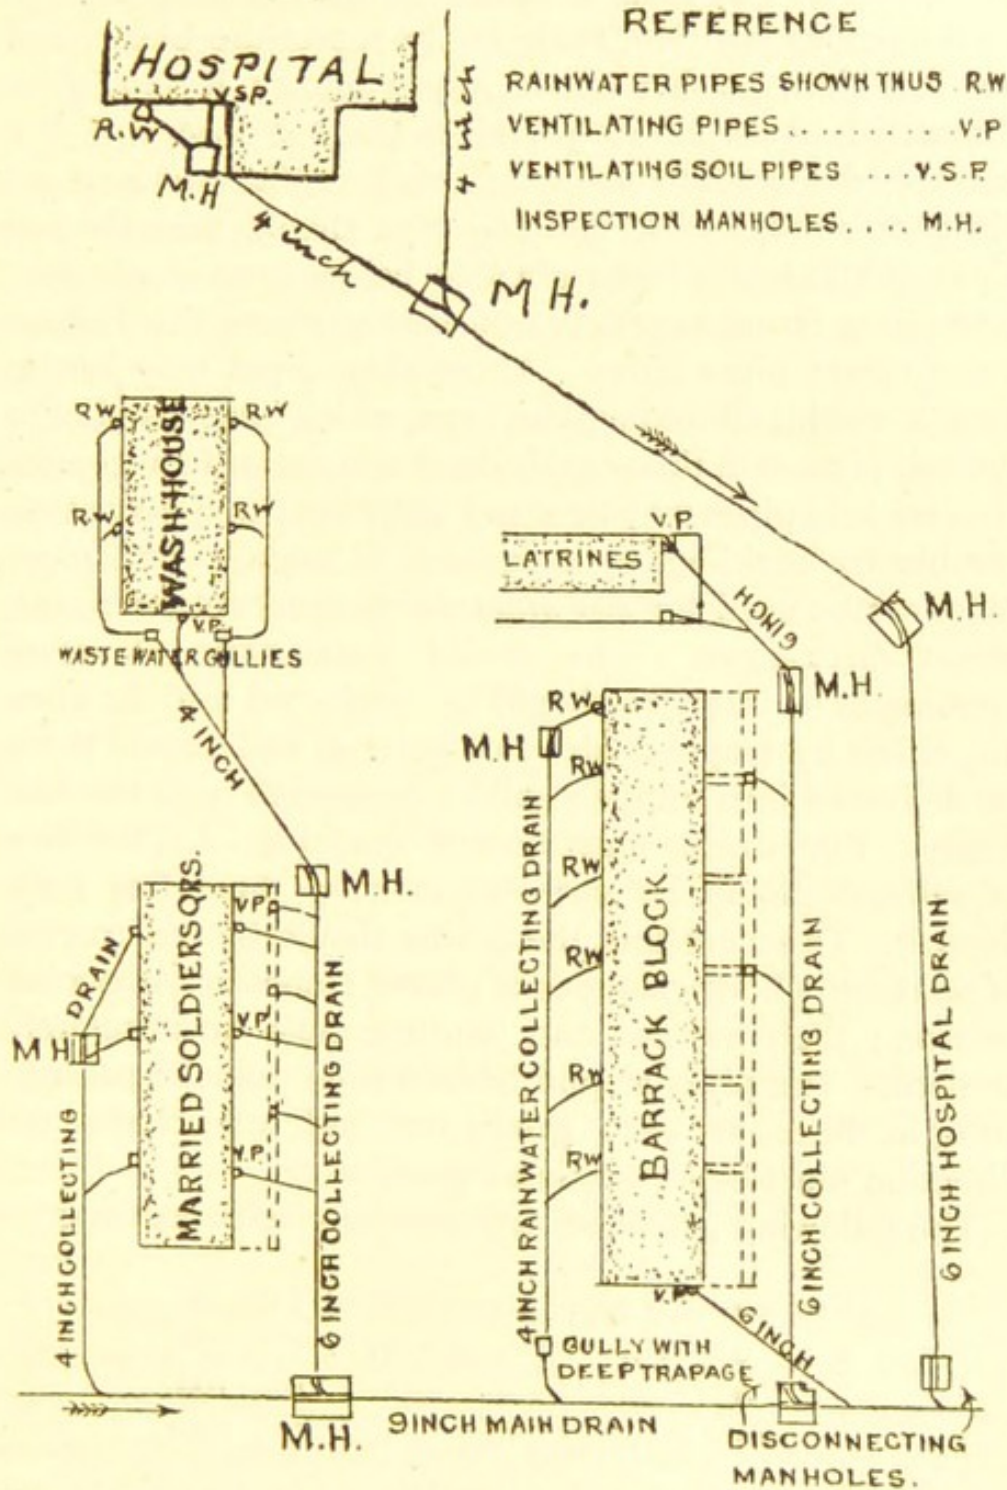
DIAGRAM SHOWING BRANCH, COLLECTING AND MAIN DRAINS OF A MILITARY BARRACKS.
